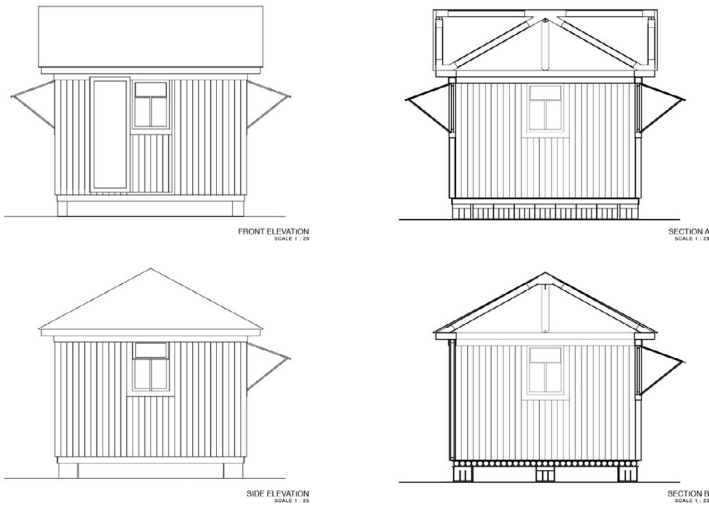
Elevations & Sections [Tadaima, n.d.]
